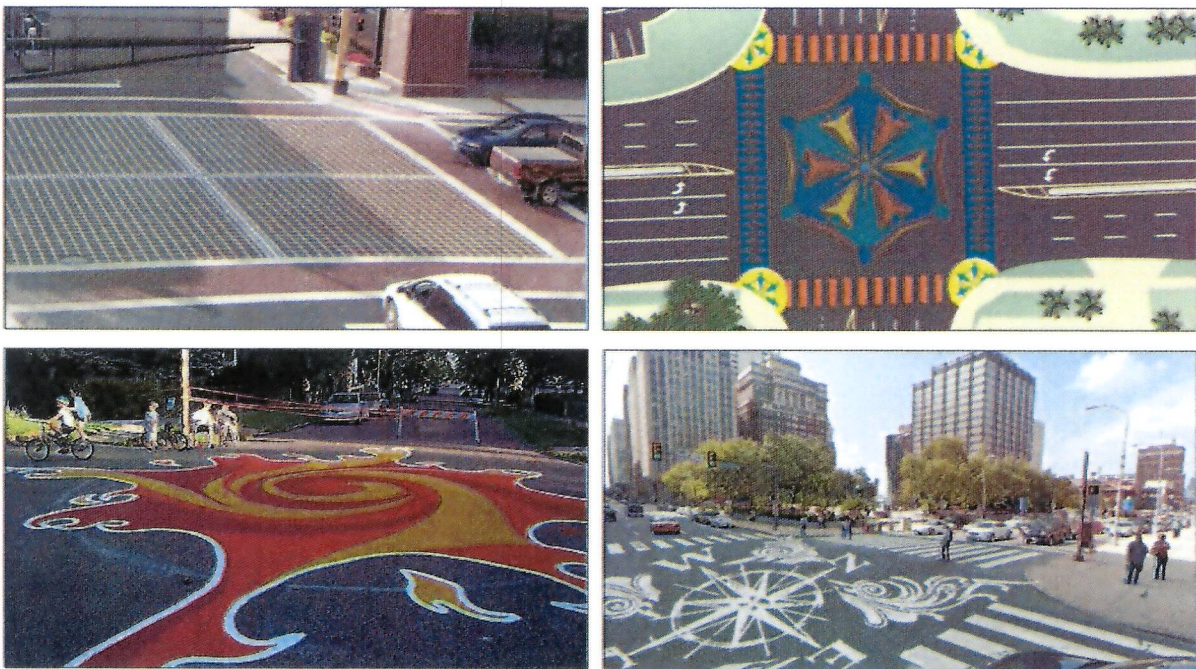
Wilmington Avenue and East 120th/East 119th Street intersection
